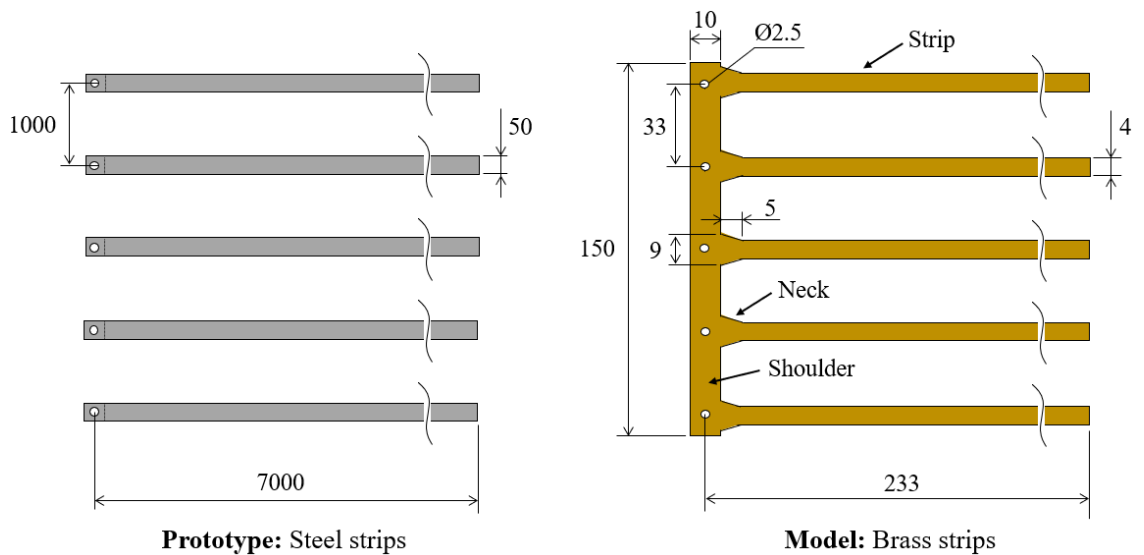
Plan view sketch of the inextensible reinforcement used in the prototype and model. Sketch is not drawn-to-scale and all dimensions are in millimetres.
